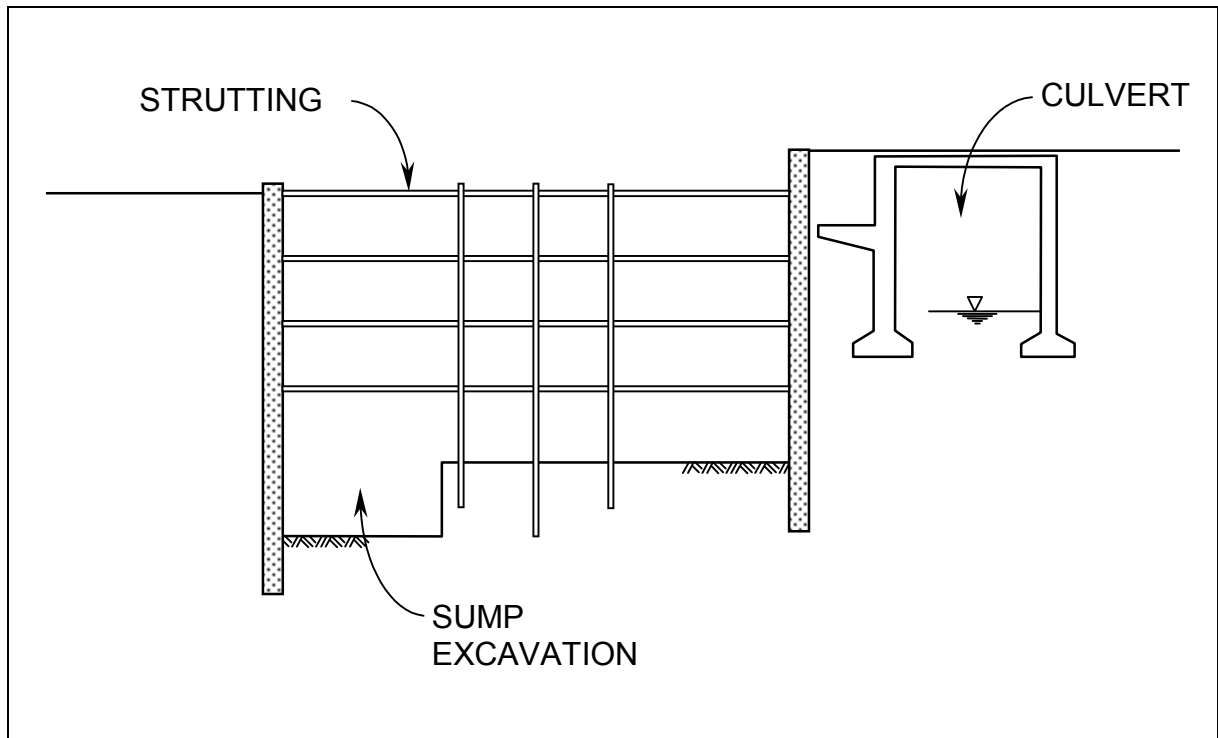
Section Through Diaphragm Wall in Seoul, South Korea 1989
